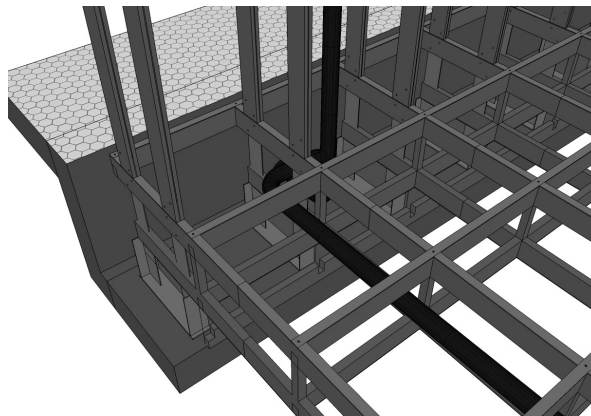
the foundation system will require special attention as not to damage the soil ground of each place. The structure is based in the foundation. The reinforcement is already precut and available to put it in the hollowness of the structure the pipes have enough place to move along their spaces. These pipes can ``appear`` whenever they are required, by cutting the floor, partition or ceiling panel when it is needed.
